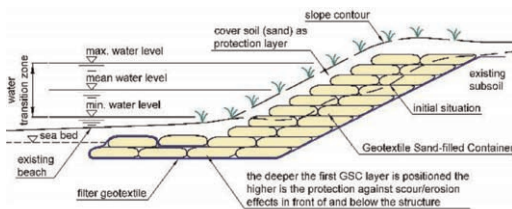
Schematic cross-section dune protection with Geotextile Sand Containers (GSC) underground structure, covering with beach sand and planting with helm grass.
